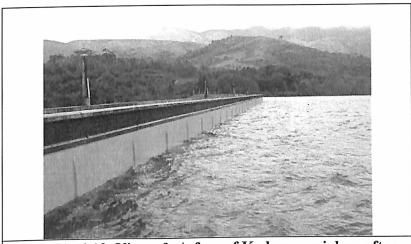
View of u/s face of Kadamparai dam after geo-membrane installation
